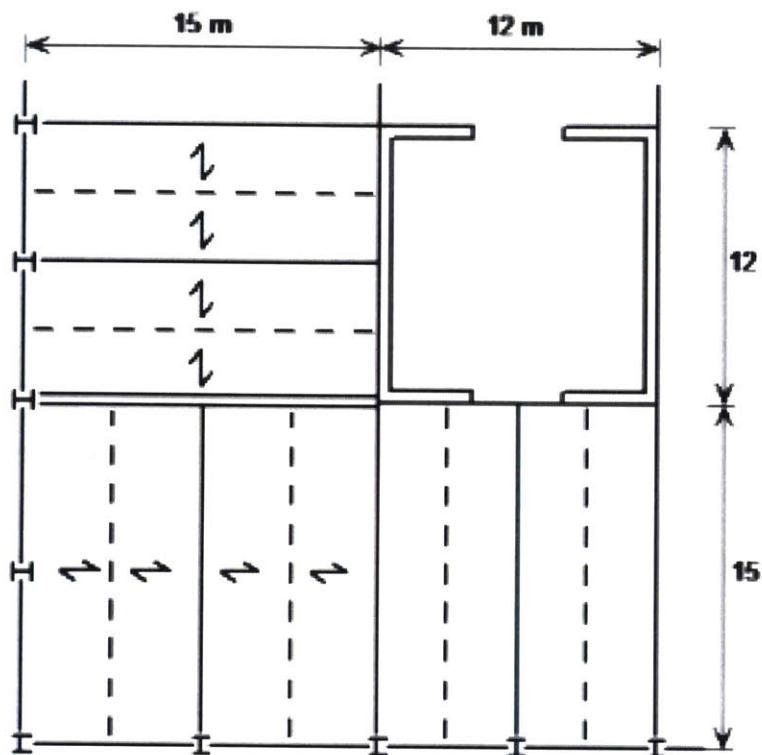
TYPICAL BEAM LAYOUT AROUND CONCRETE CORE (STEELCONSTRUCTION.INFO)
